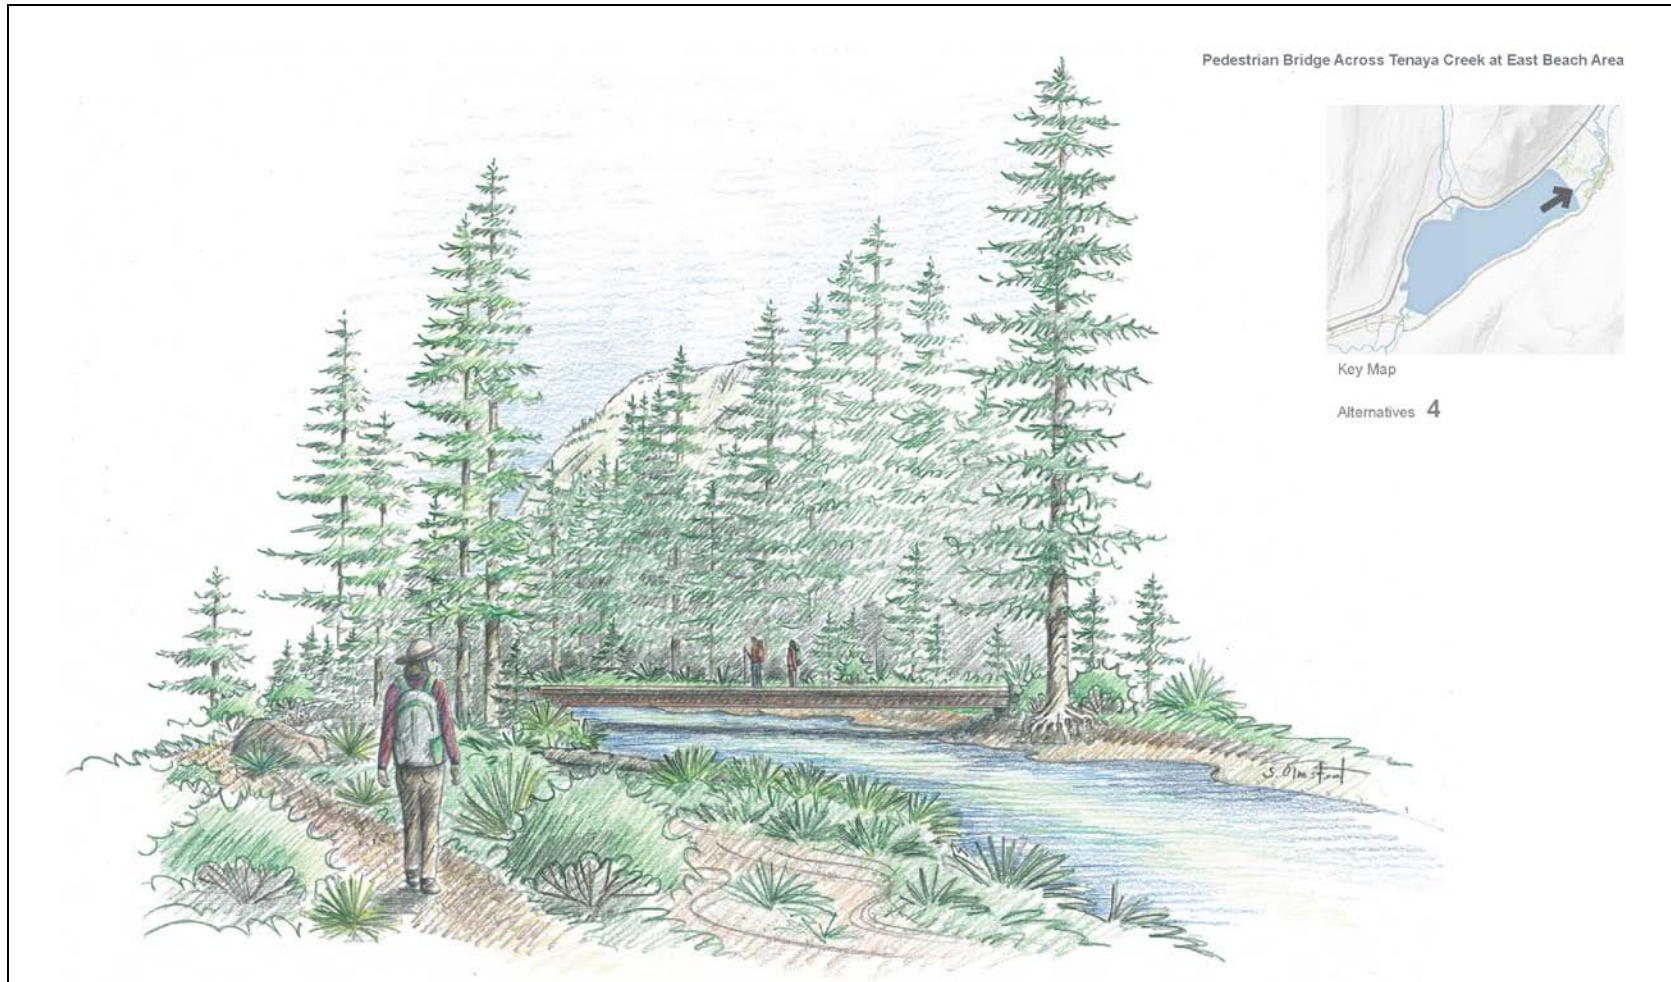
Alternative 4 East Beach Bridge Over Tenaya Lake Inlet
